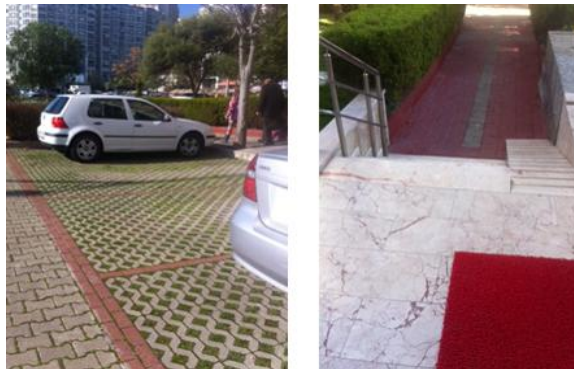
Parking Spaces and Ramps Connecting to Building
